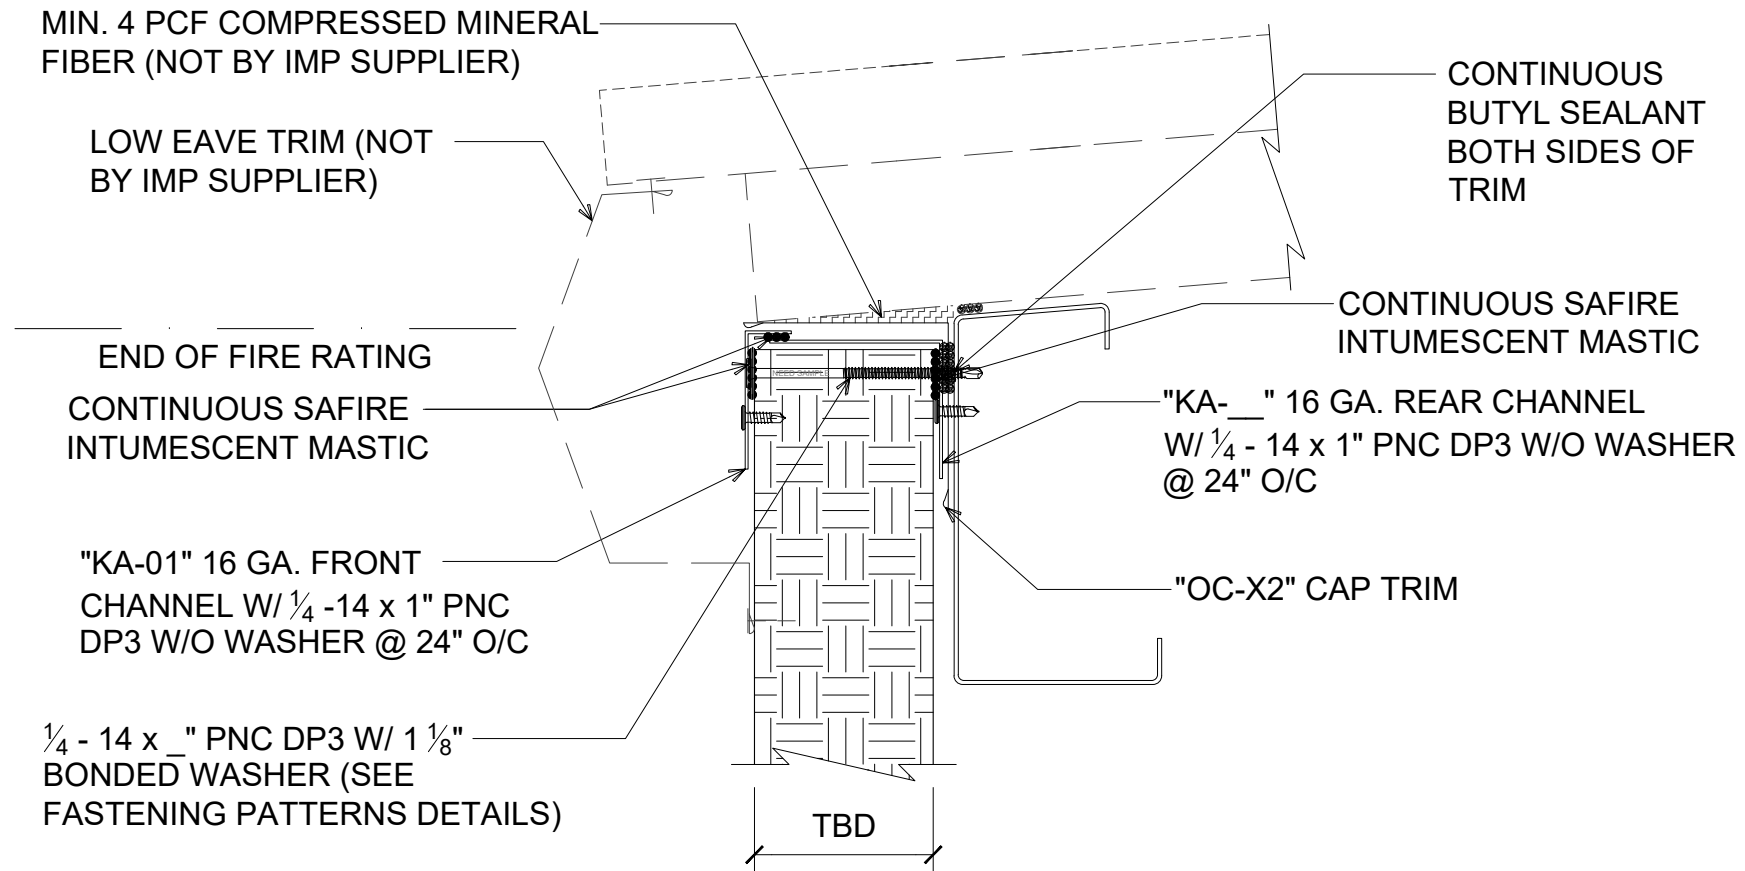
DETAIL: PARAPET WALL - PROFILED		SHEET: 1 of 1
